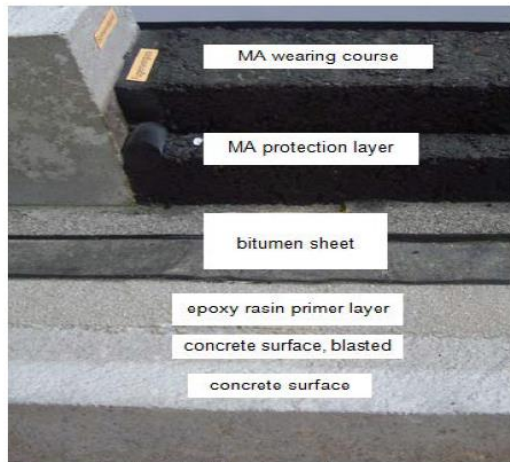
Type 1- Waterproofing layer with bitumen sheet
